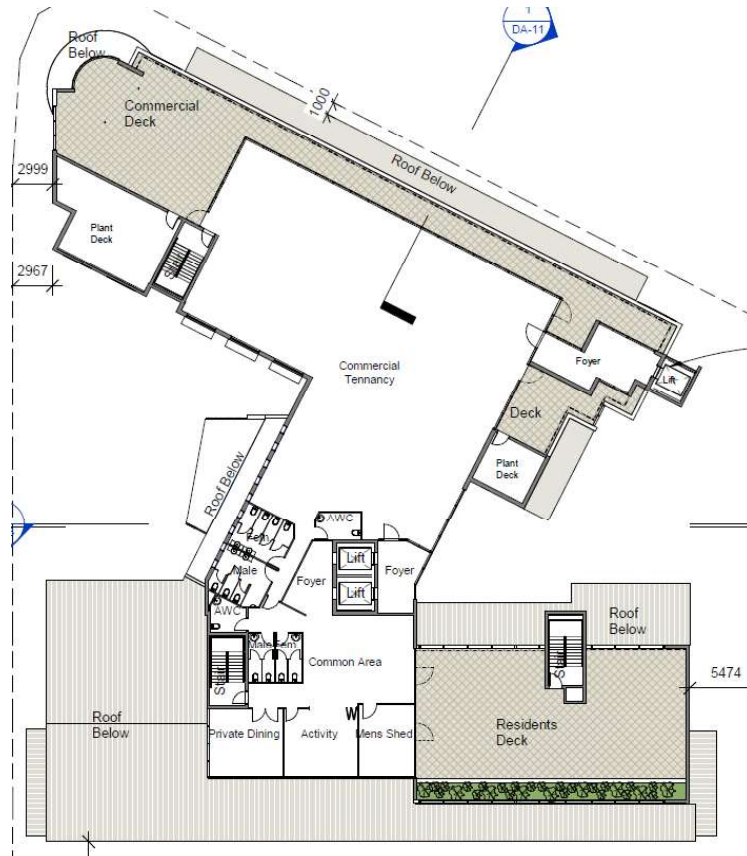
Proposed Office Level (Level 5) Floor Plan (Source: GJG Architects)
